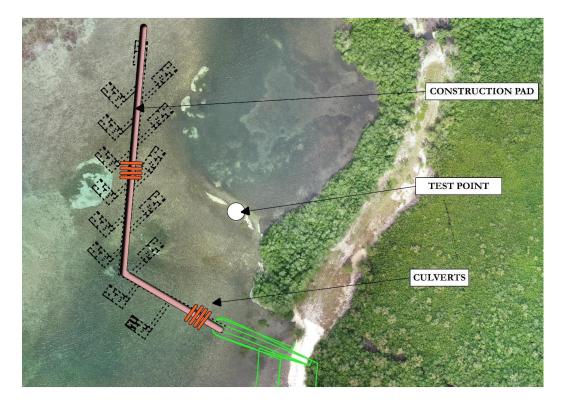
Schematic showing the layout of the construction pad and culverts for the searooms
